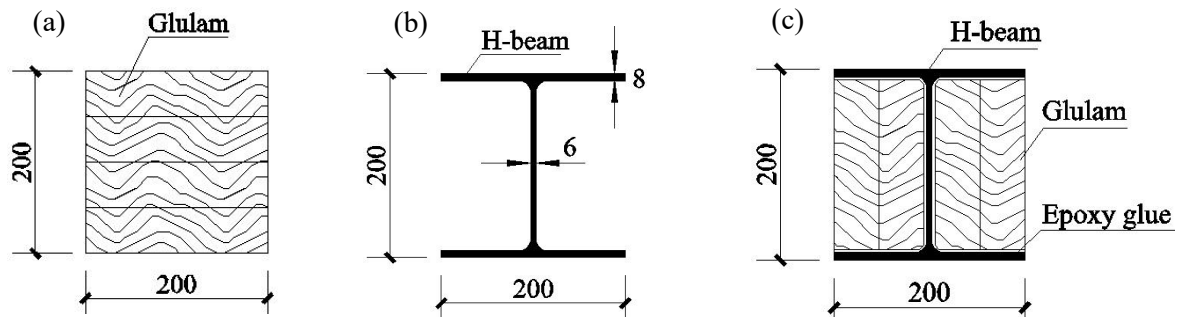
Cross-section form of column in each joint:(a)JT joint ;(b)JS joint;(c)JSTC joint
